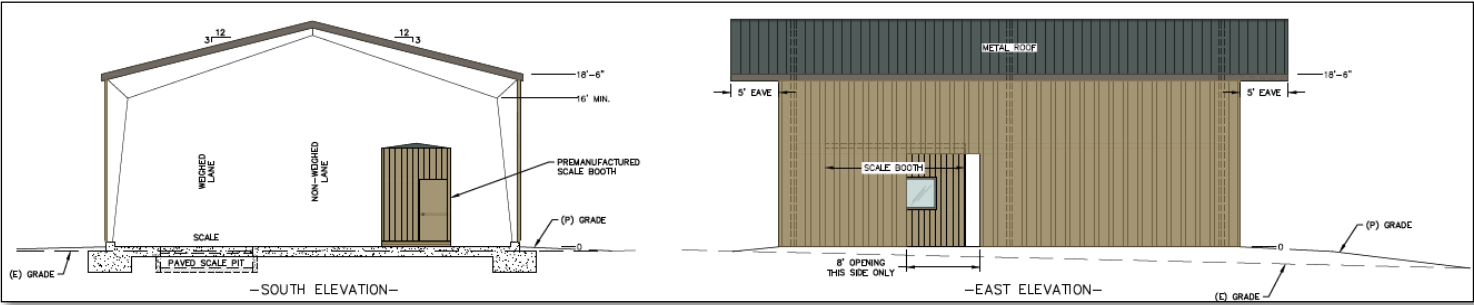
Proposed Transfer Station Building Elevations and Exterior Colors
